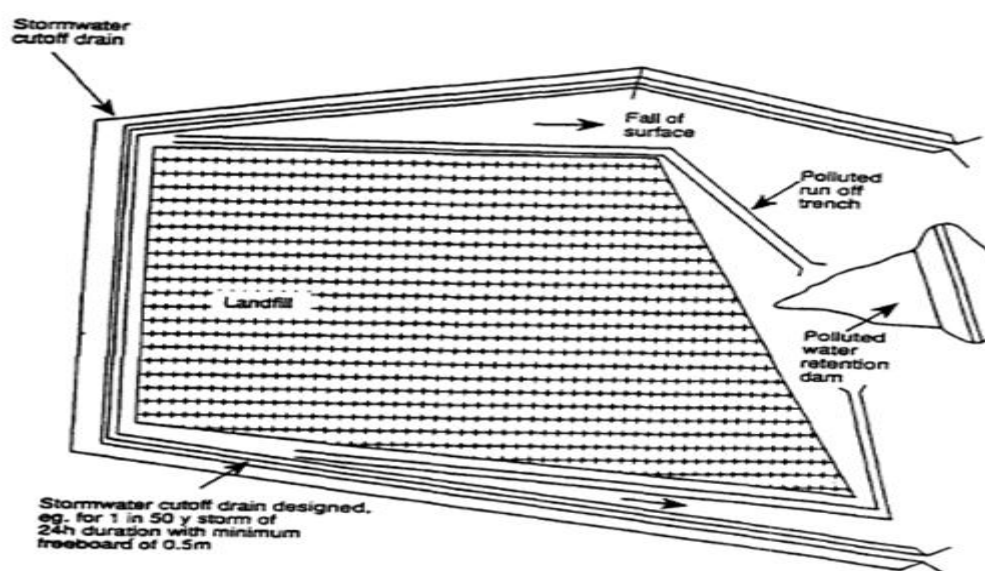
Plan view of Capped Landfill and howing shape of peripheral drains
